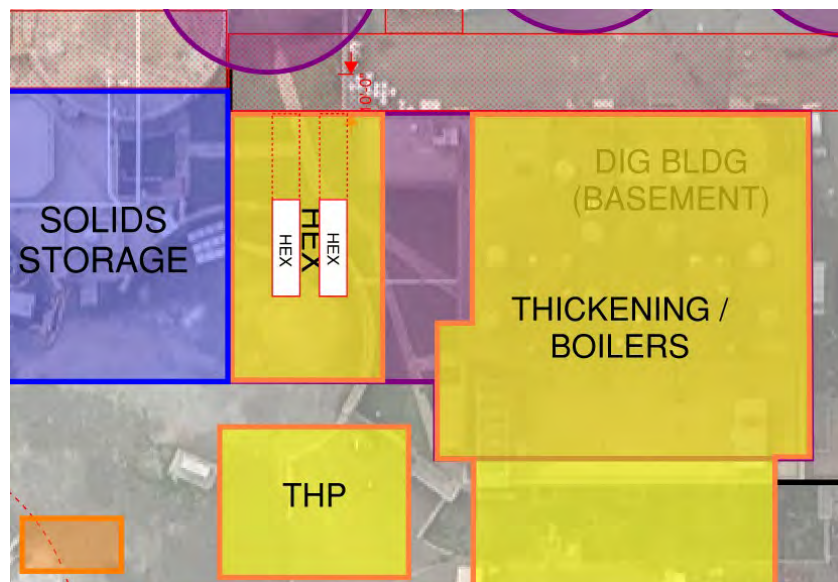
Once-Through Cooling: Equipment Plan View—Decommission Dewatering Building Option
